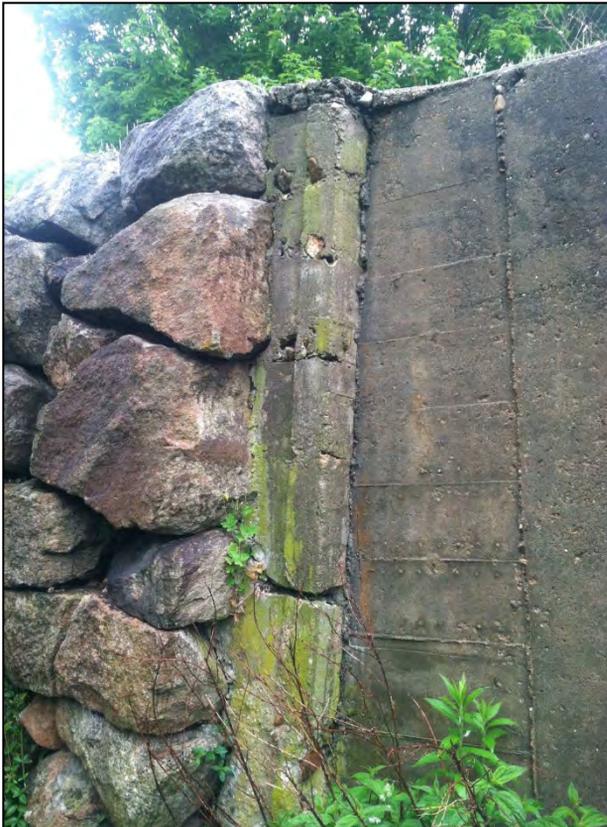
Right side of the flume's abandoned discharge. Note the spalled areas of concrete.
